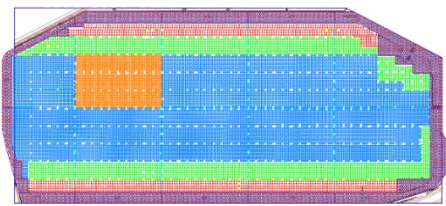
Schematic plan with the ground improvement solutions (not to scale).
